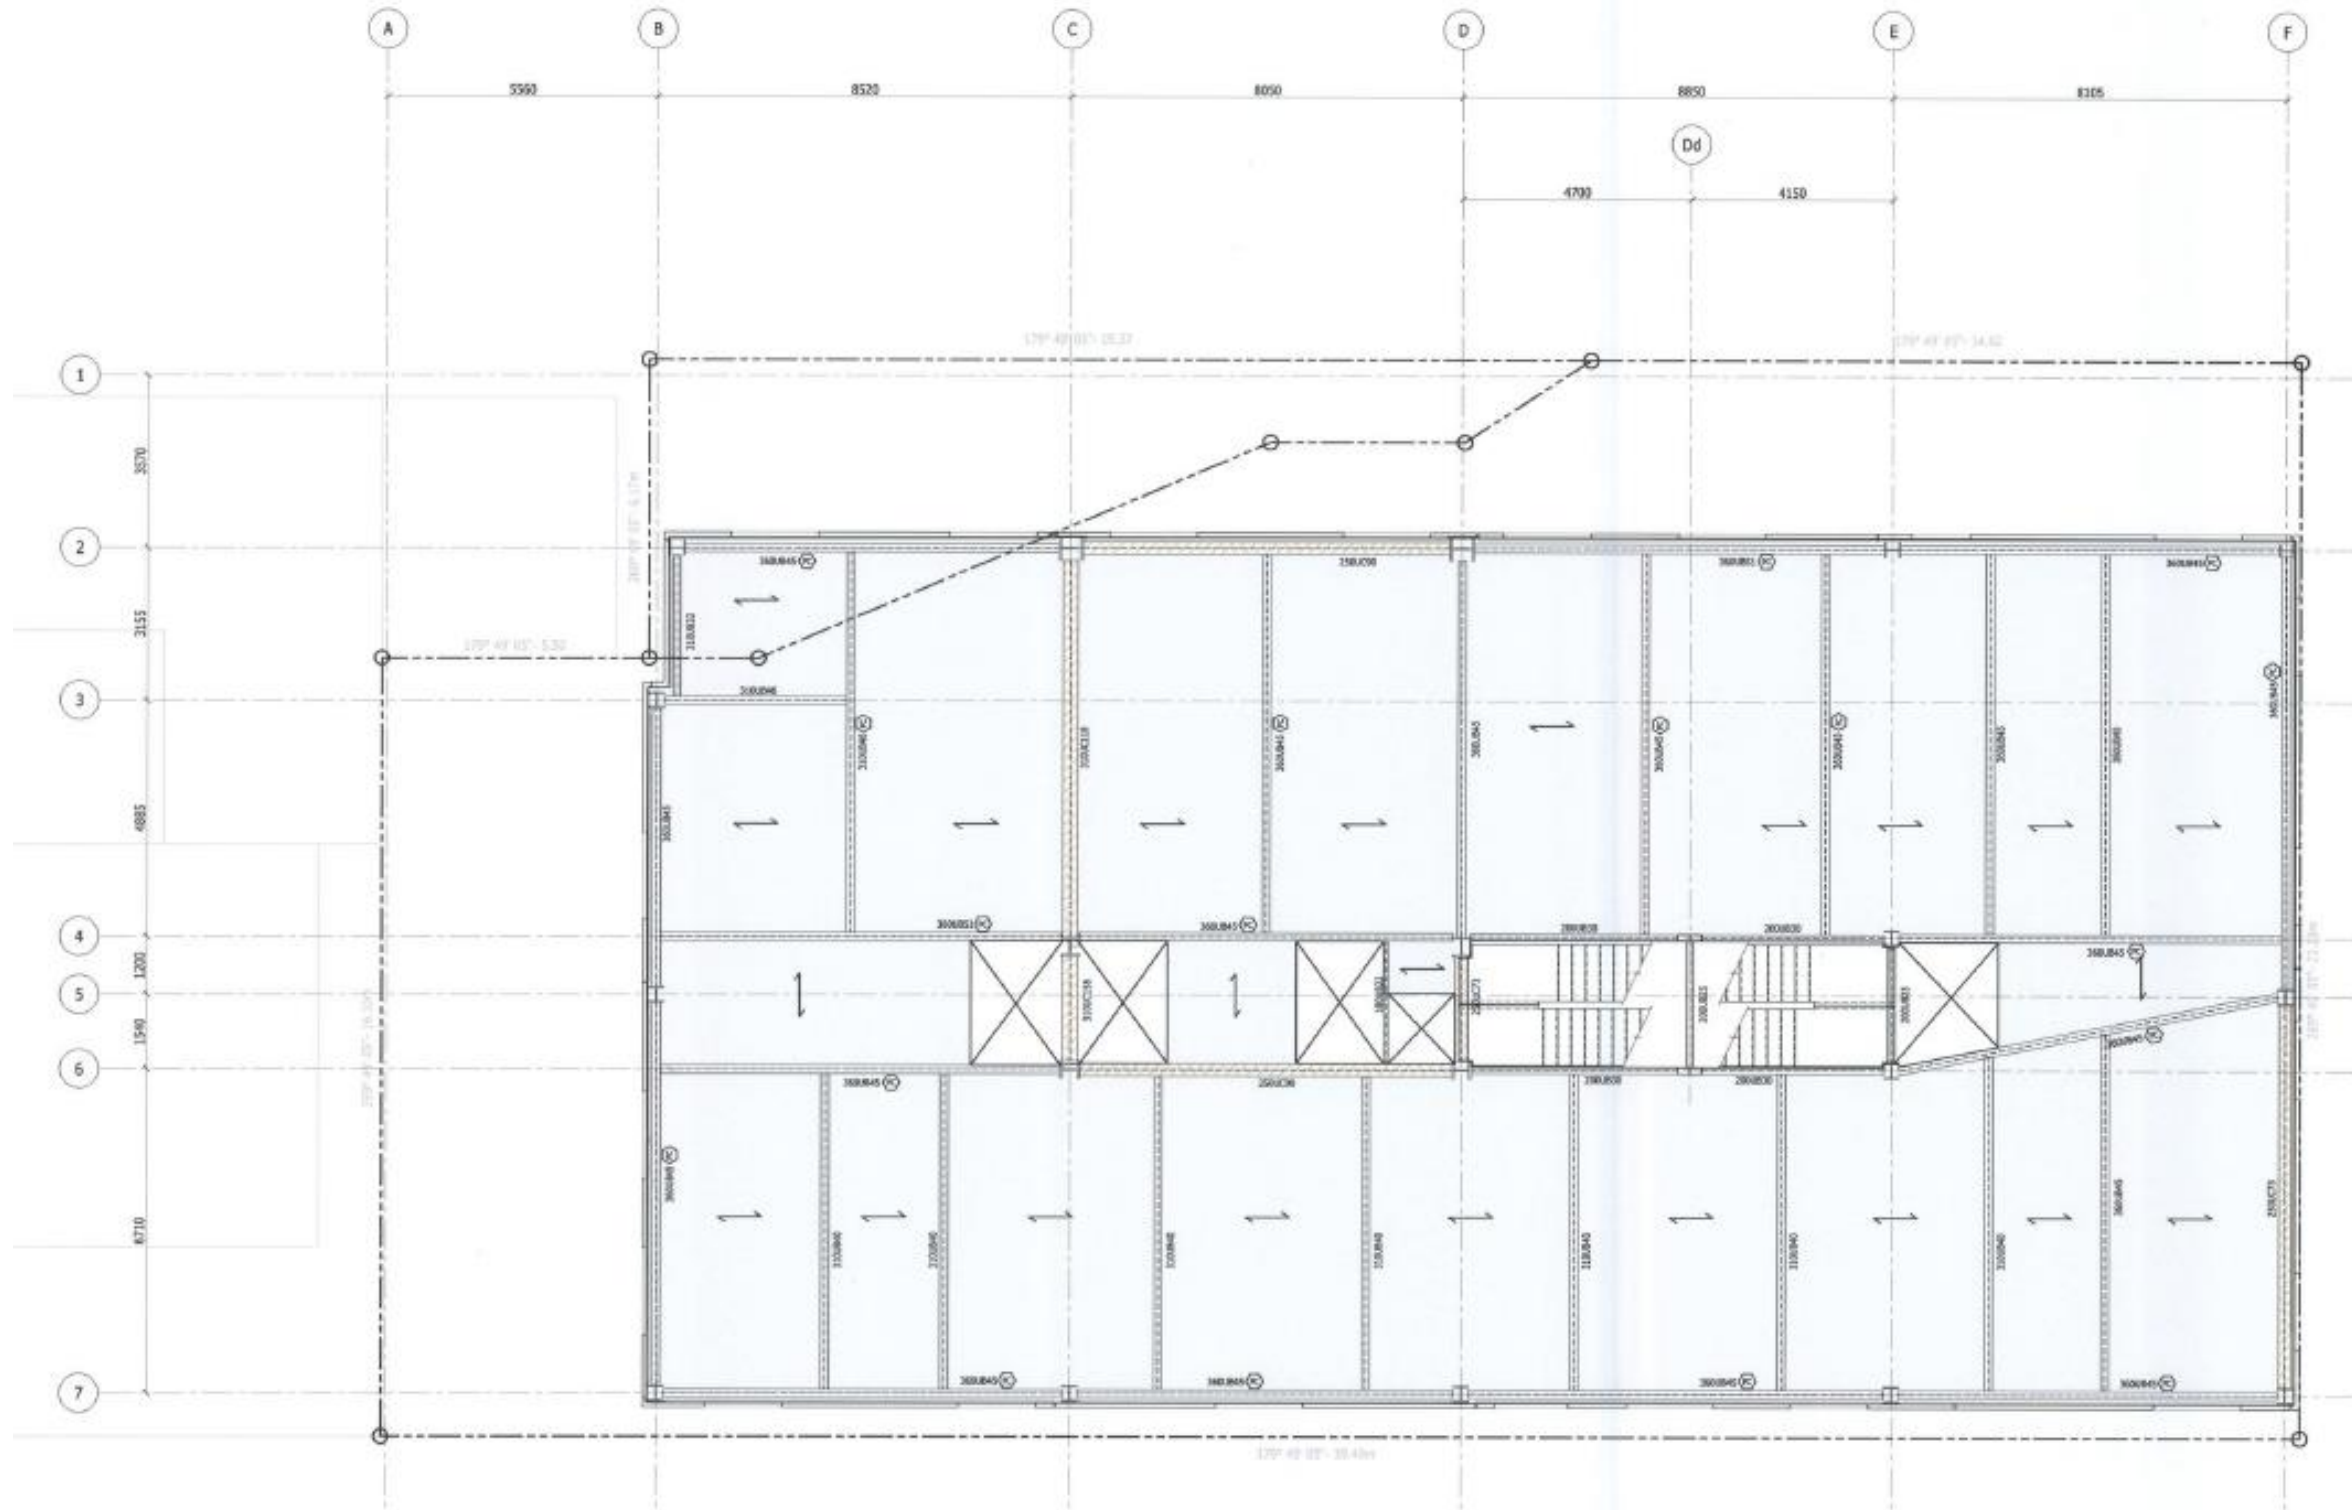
Structural Plan Level 7 (Christchurch City Council 2016c)
